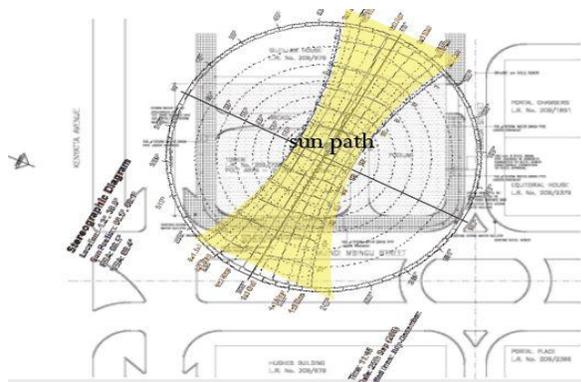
Site plan of I&M indicating sunpath. (Source: Author (2016))
